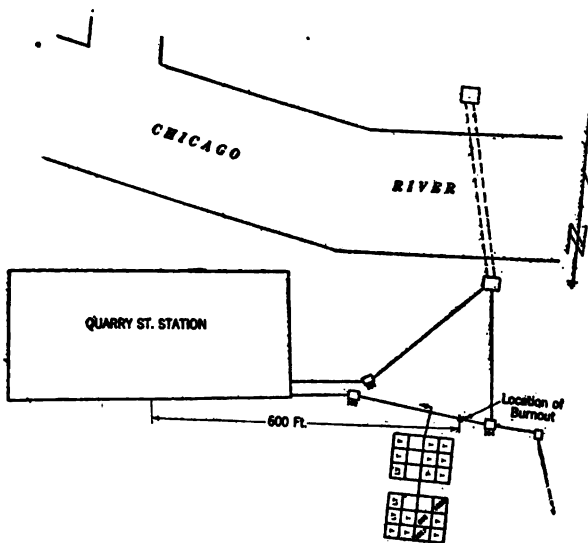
PLAN SHOWING CONDUIT LOCATION AND POINTS OF BURNOUTS—
